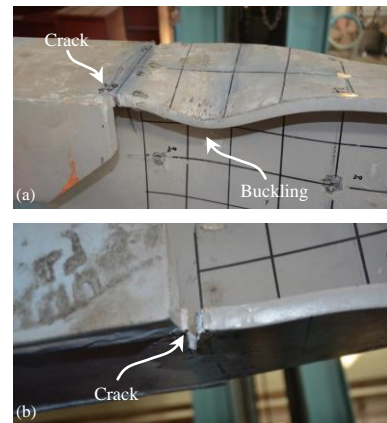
Failure modes of specimen I: (a) local buckling and crack of top flange; (b) crack at bottom flange
